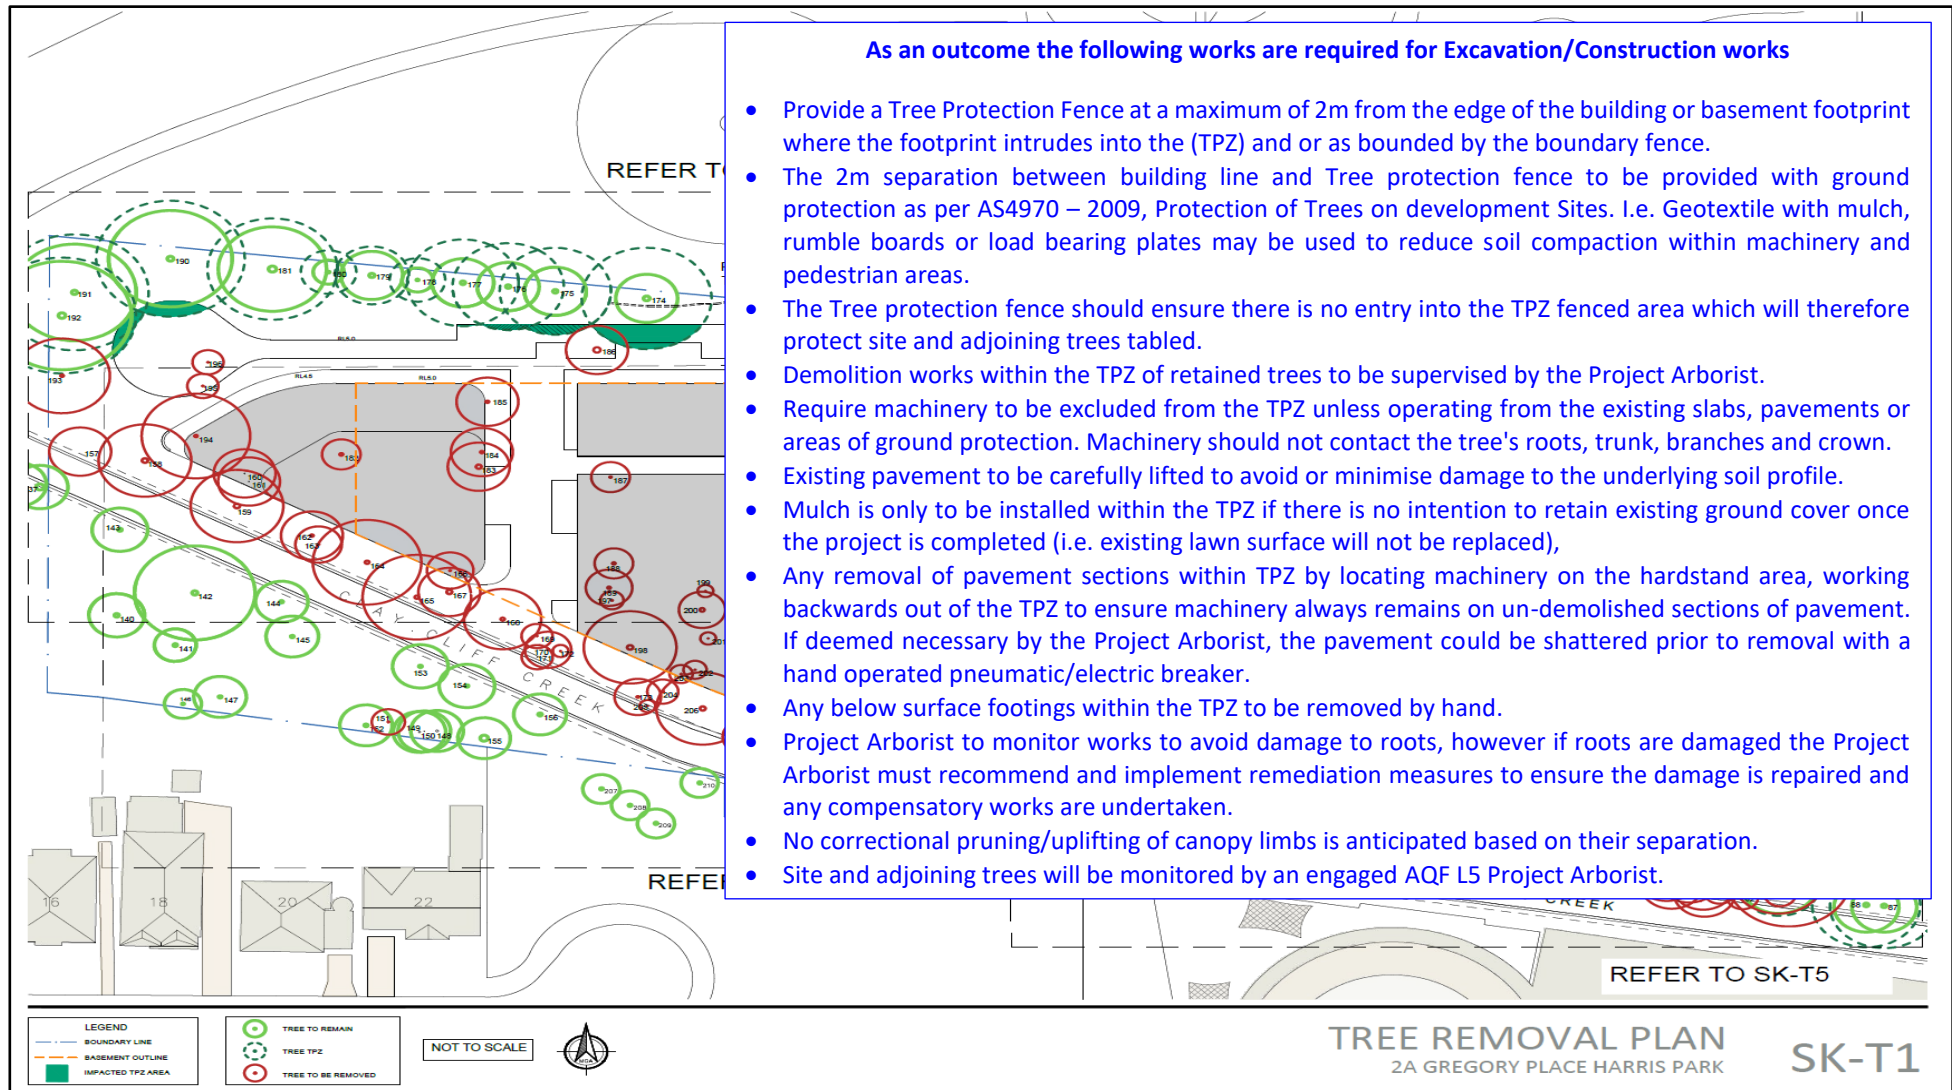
Shows site and adjoining tree protection measures regarding excavation and construction stages.
